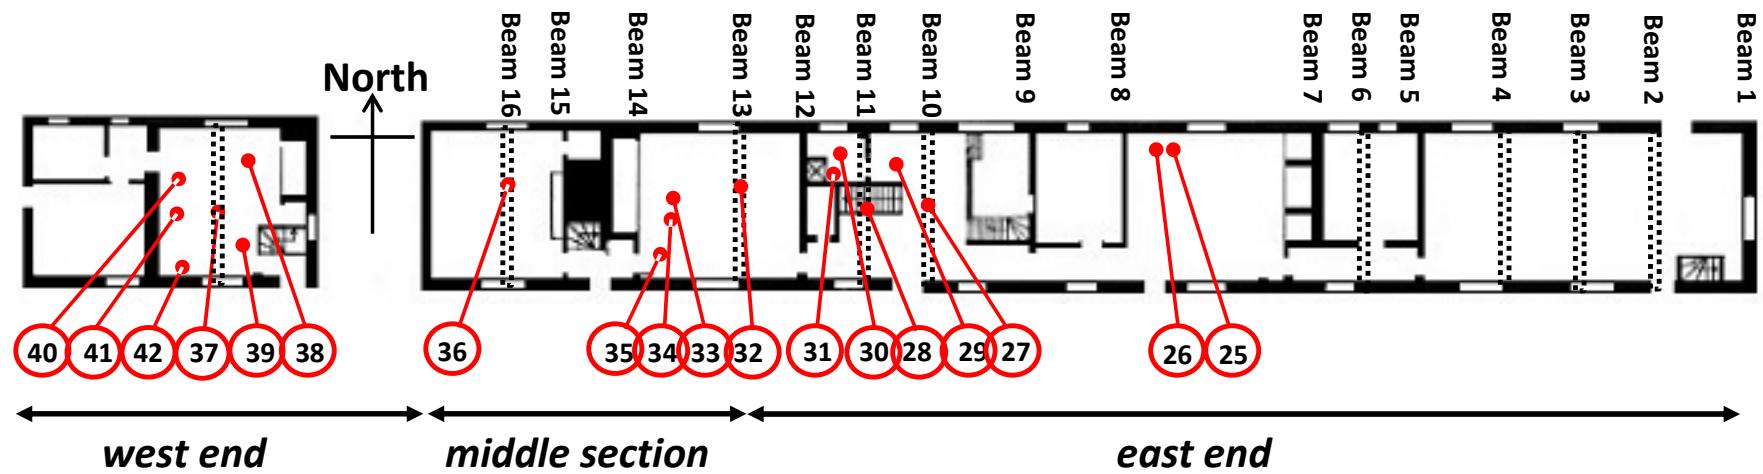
Simple plan of the hall range at ground-floor level to help locate sampled timbers
